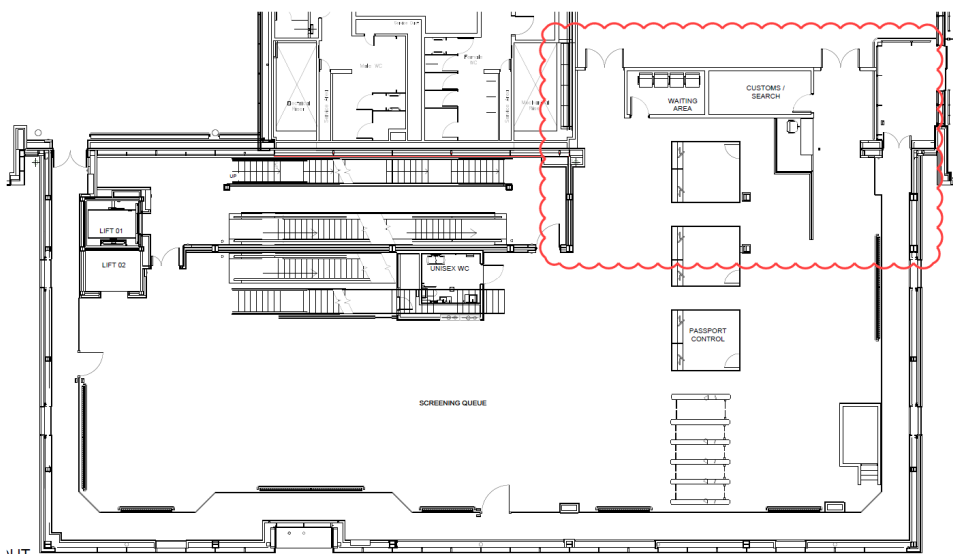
Layout of proposed expansion of Pier 4 Facility
